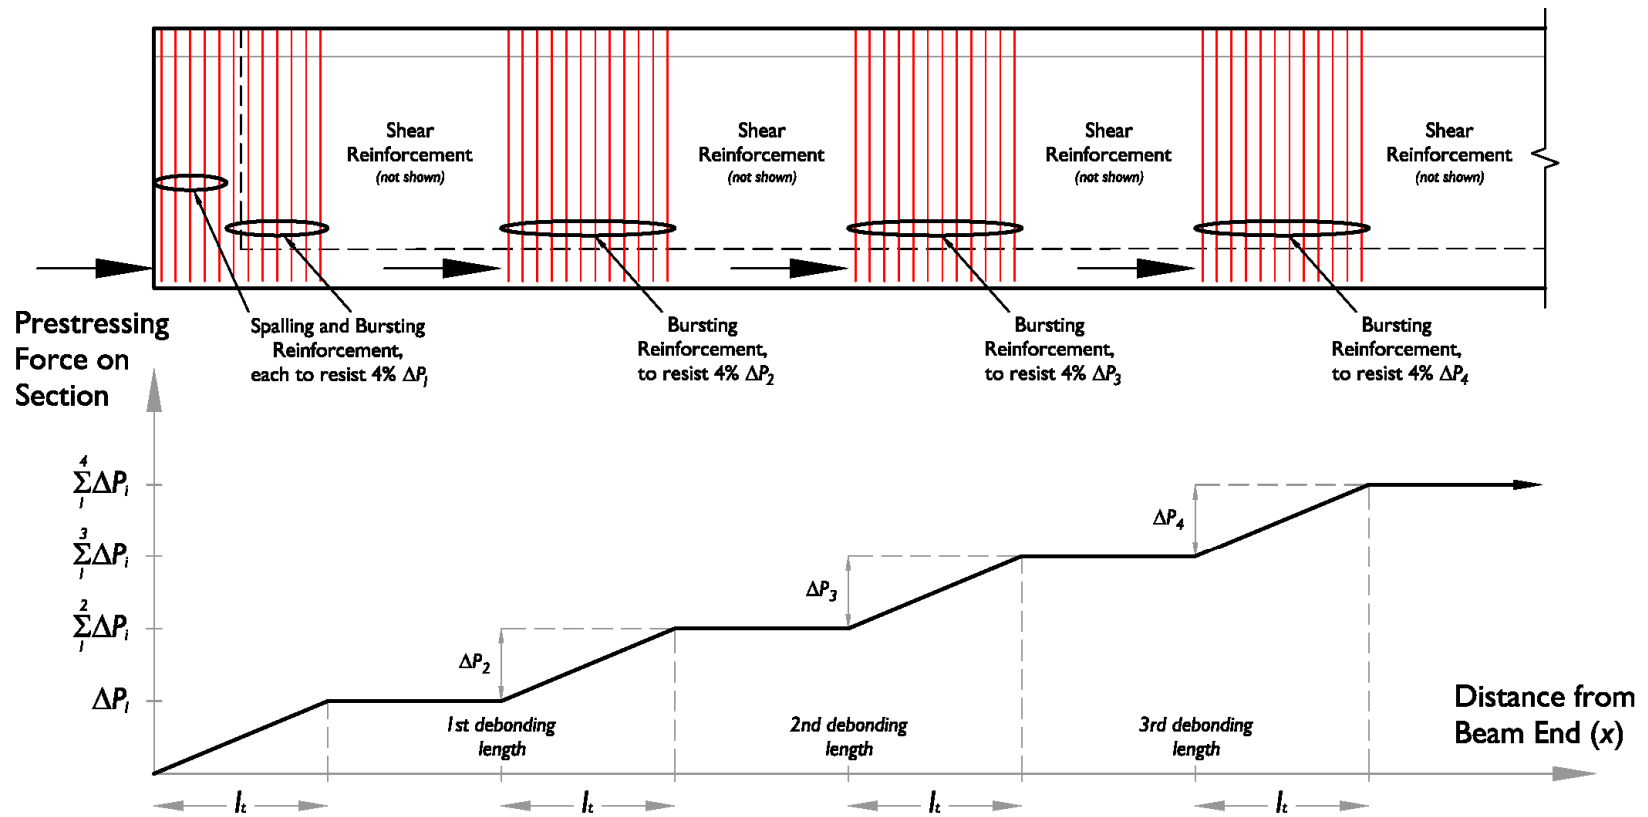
Design of bursting & spalling reinforcement in a U-beam with debonded strand
